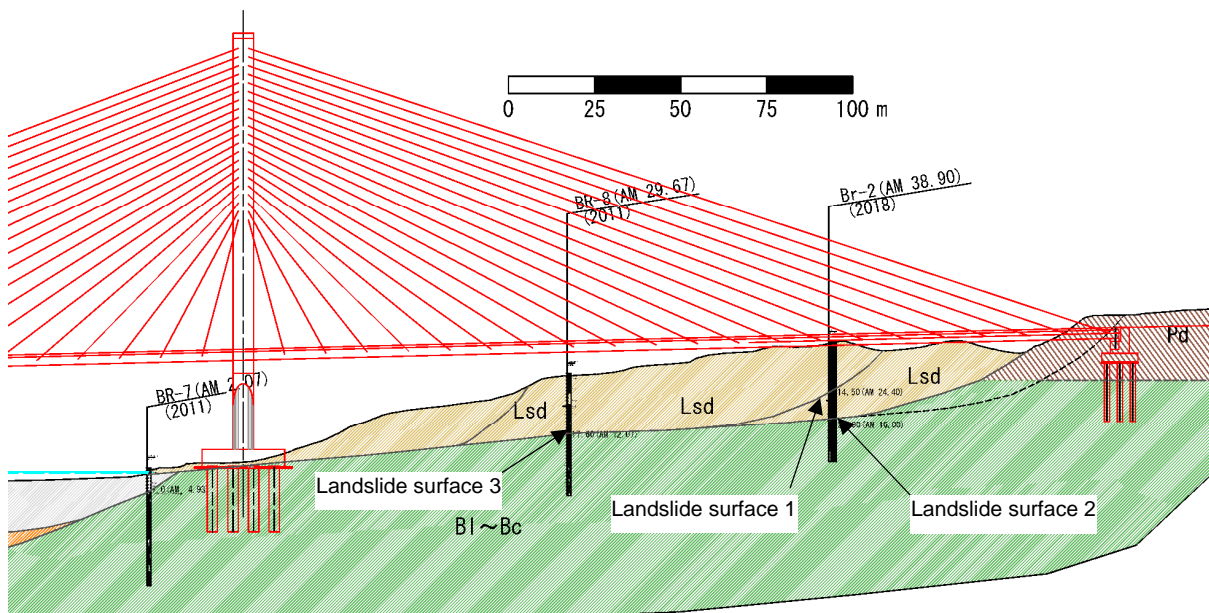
Image of each Boring Site on the Right Bank Slope (Route 2)
